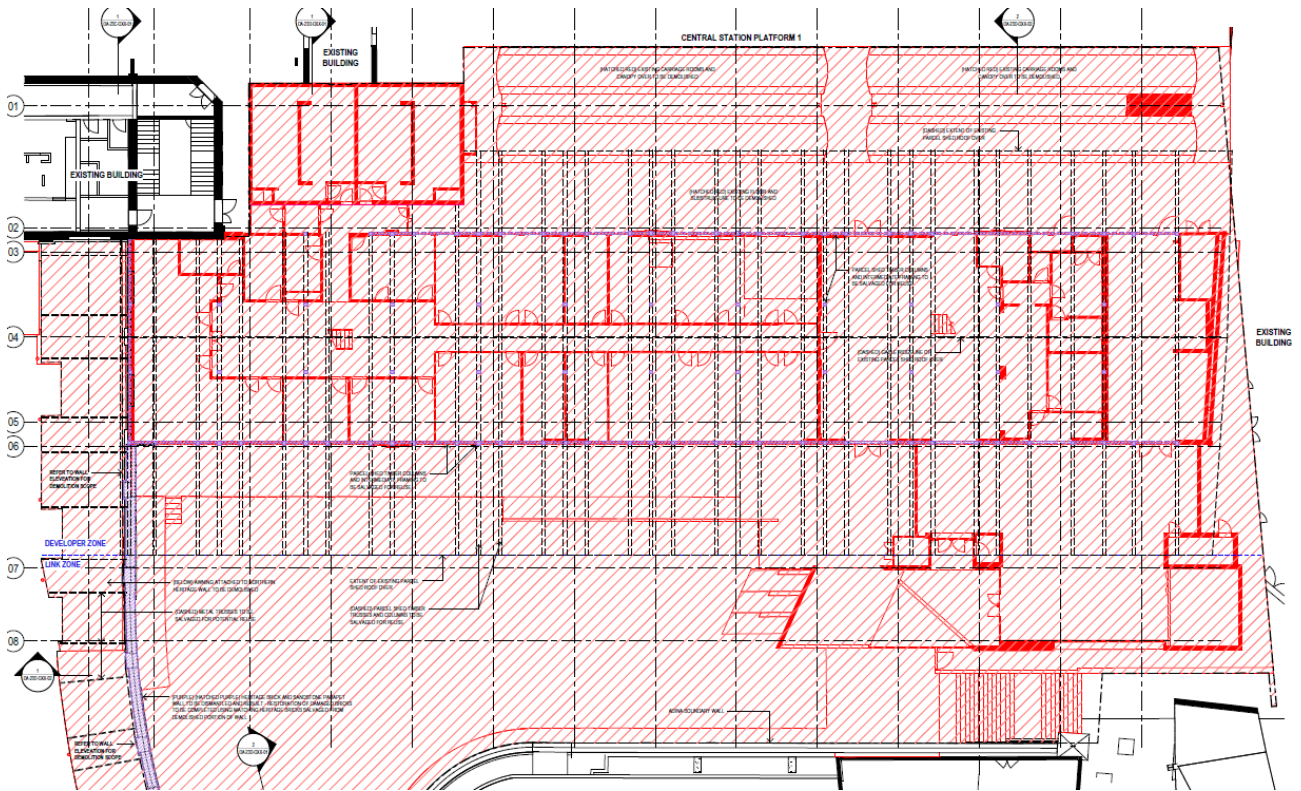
Extract of demolition and dismantling plan: upper ground floor part 1
